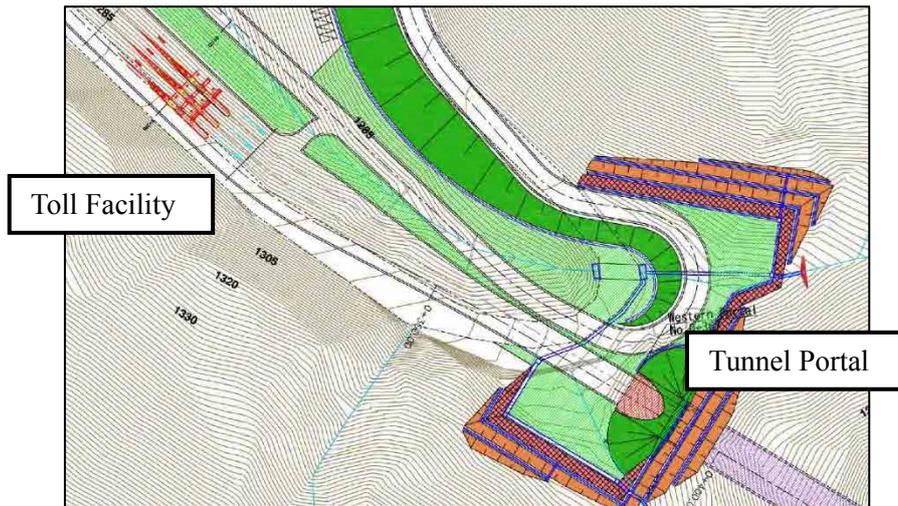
(1) TOLL BOOTH LAYOUT AT WESTSIDE
